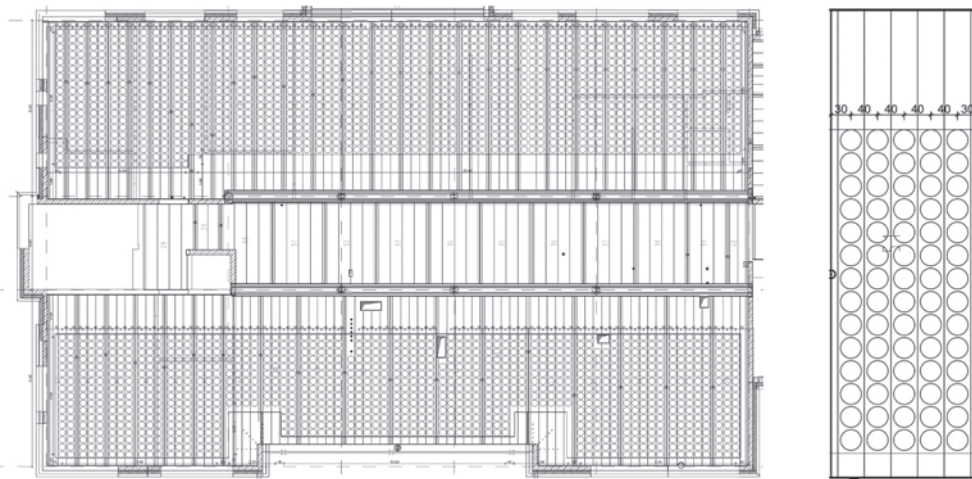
Installation plan with slab layout and void former arrangement (left) and single slab (right)
